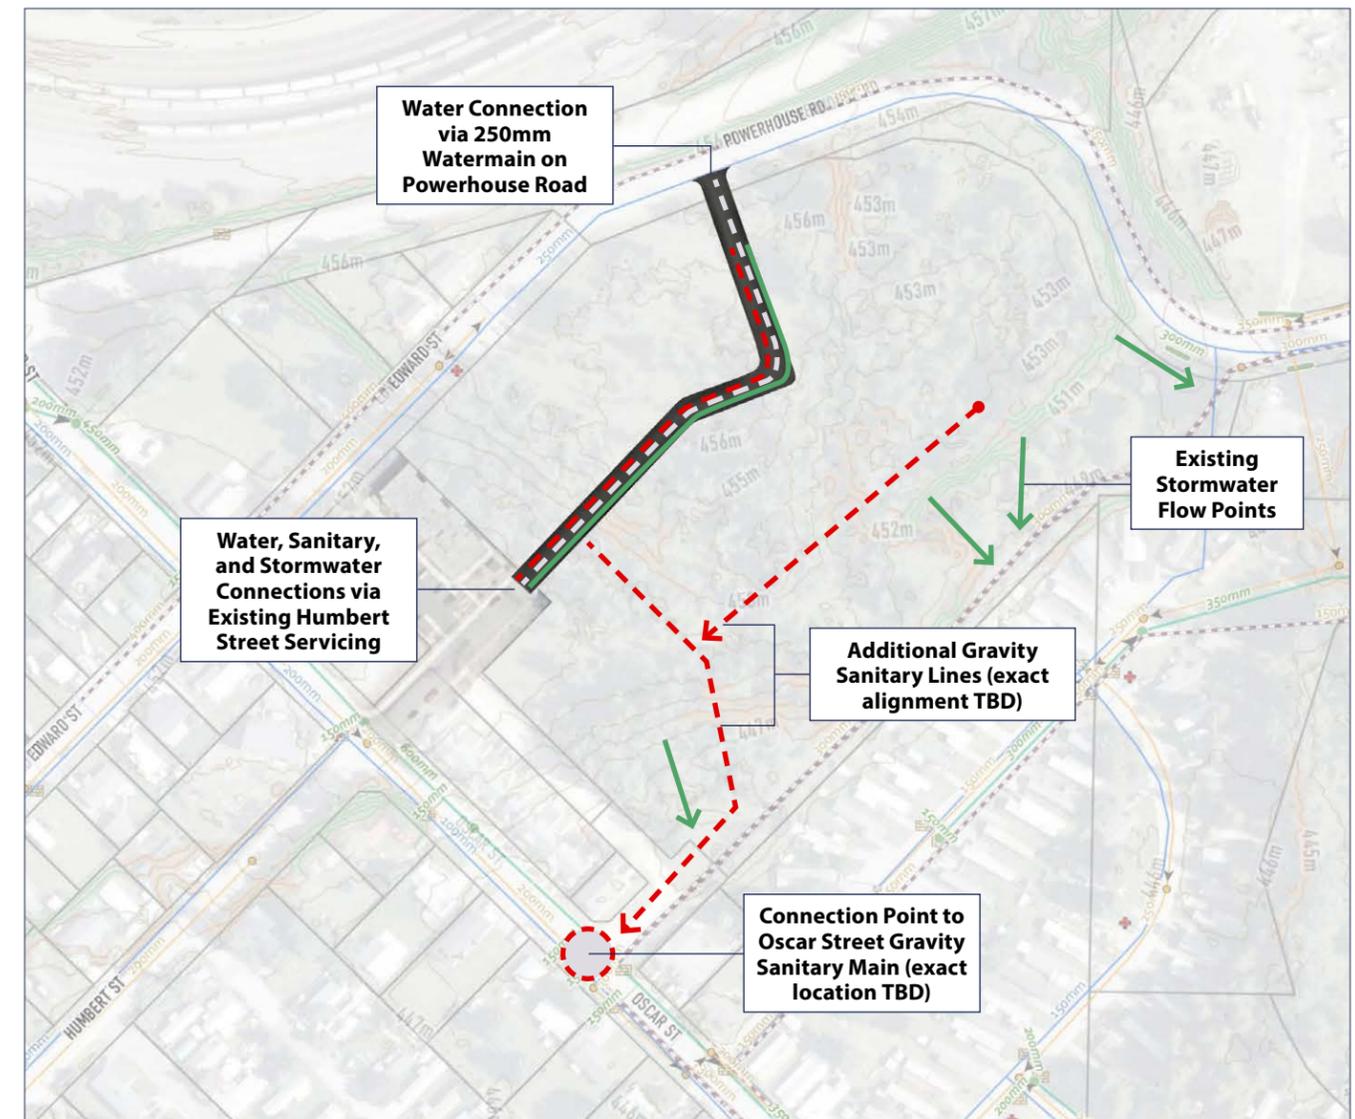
Residential Mixed-Use Concept Servicing Plan (Preliminary)
